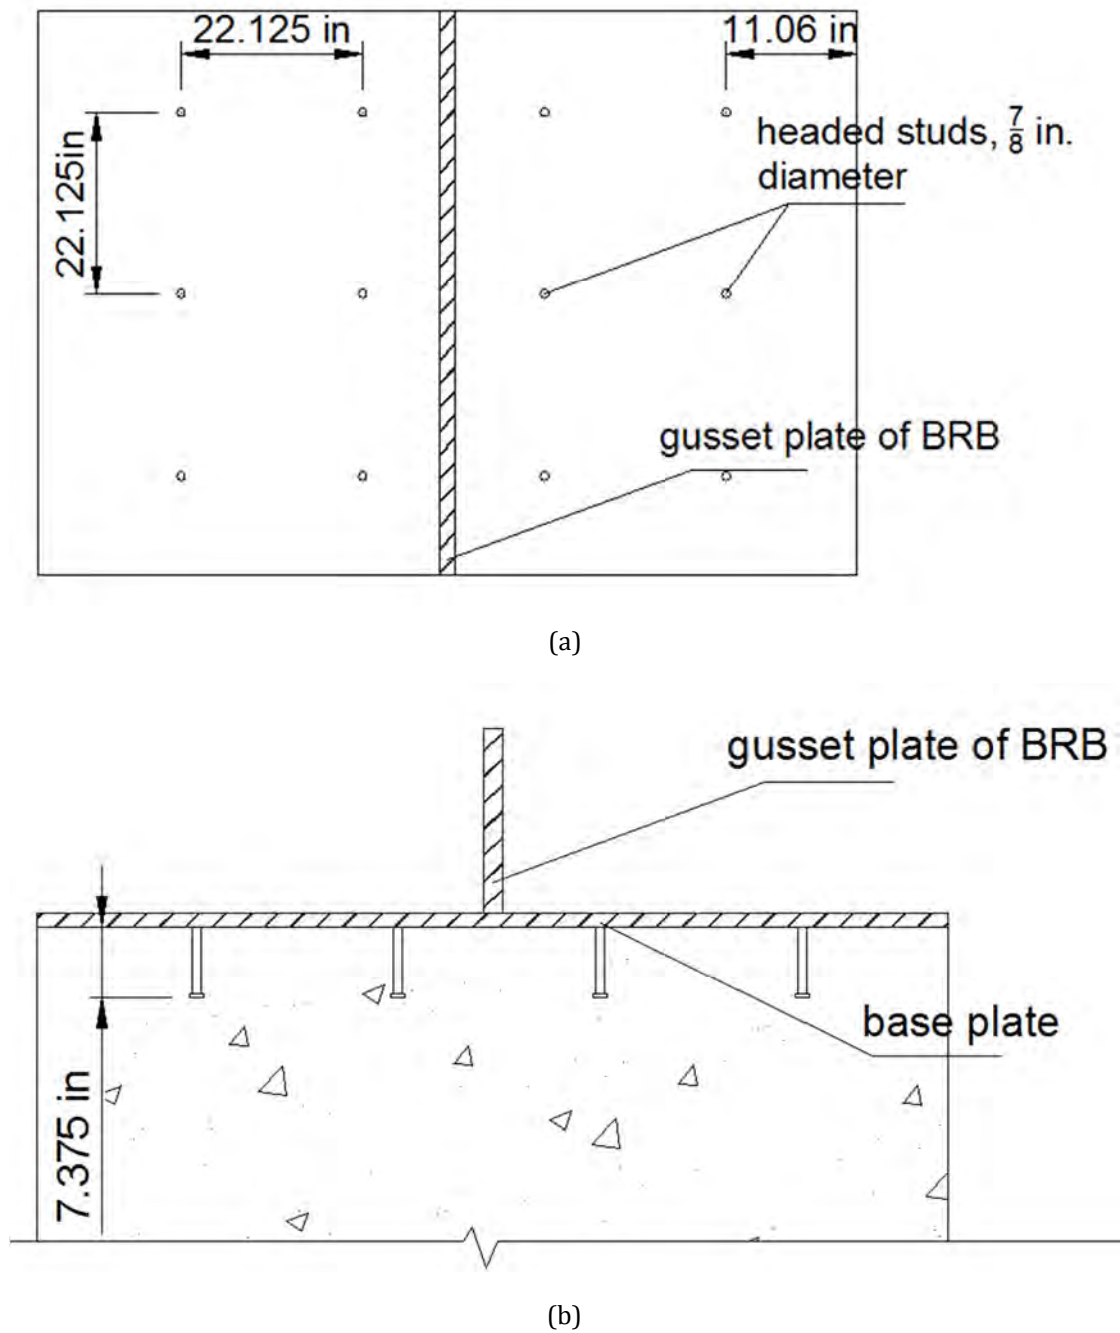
(a) Top view of BRB gusset plate connected with foundation (b) Side view
